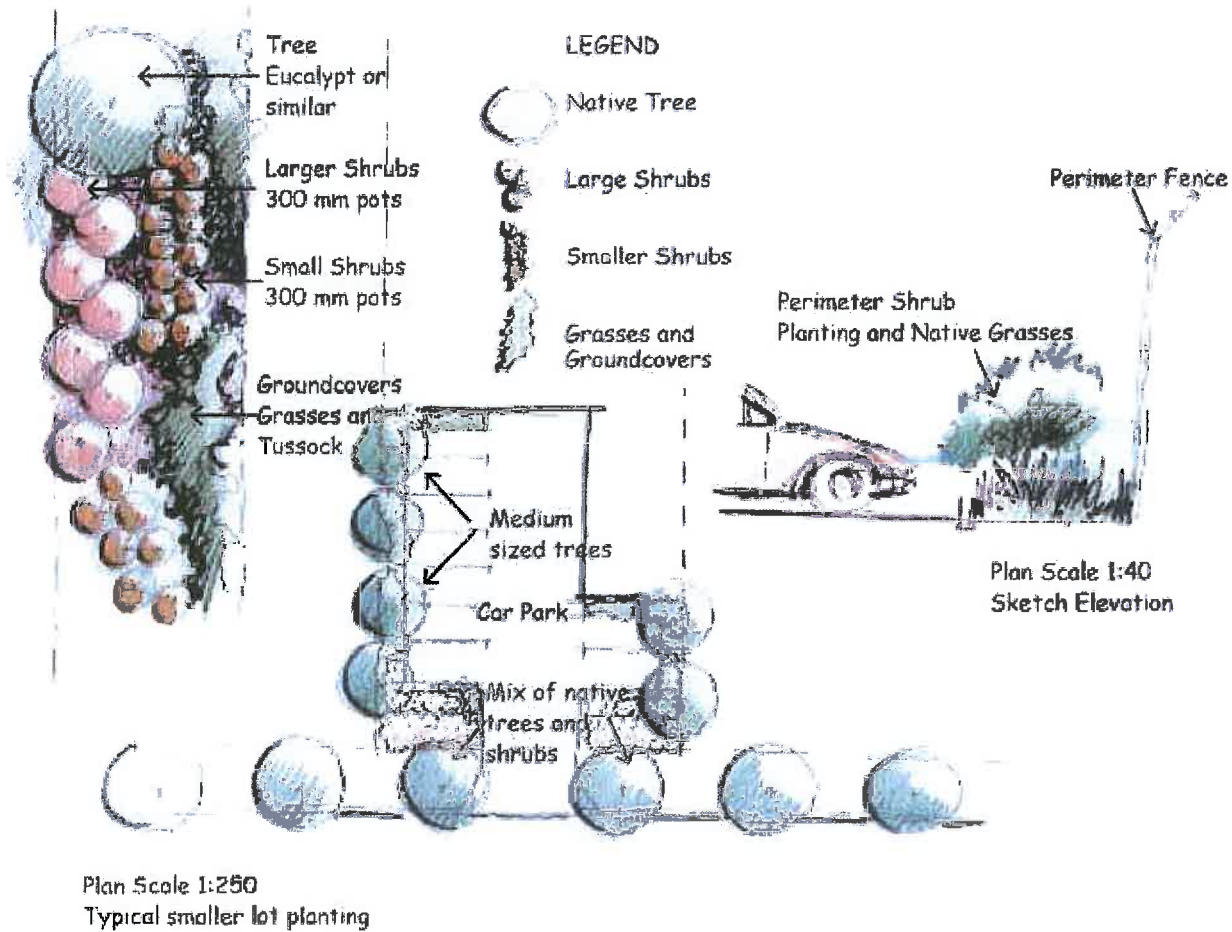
Sketch Elevation and Plan, Typical Planting Theme Screen Planting
